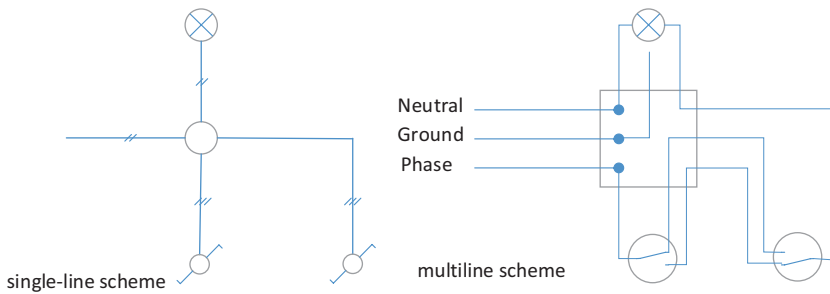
Stair or room switching connection. (Source: Authors)
